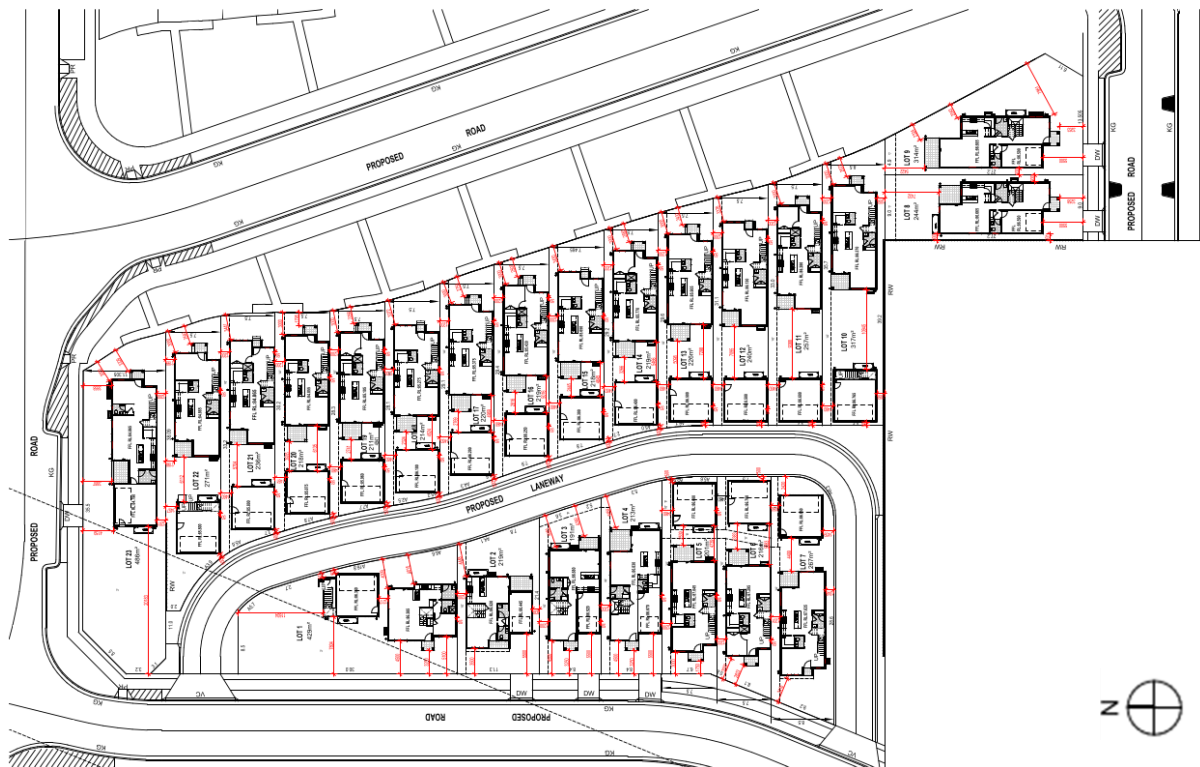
Stage 2 - Ground Floor Plans - Western Allotment (Source: New Living Homes)
